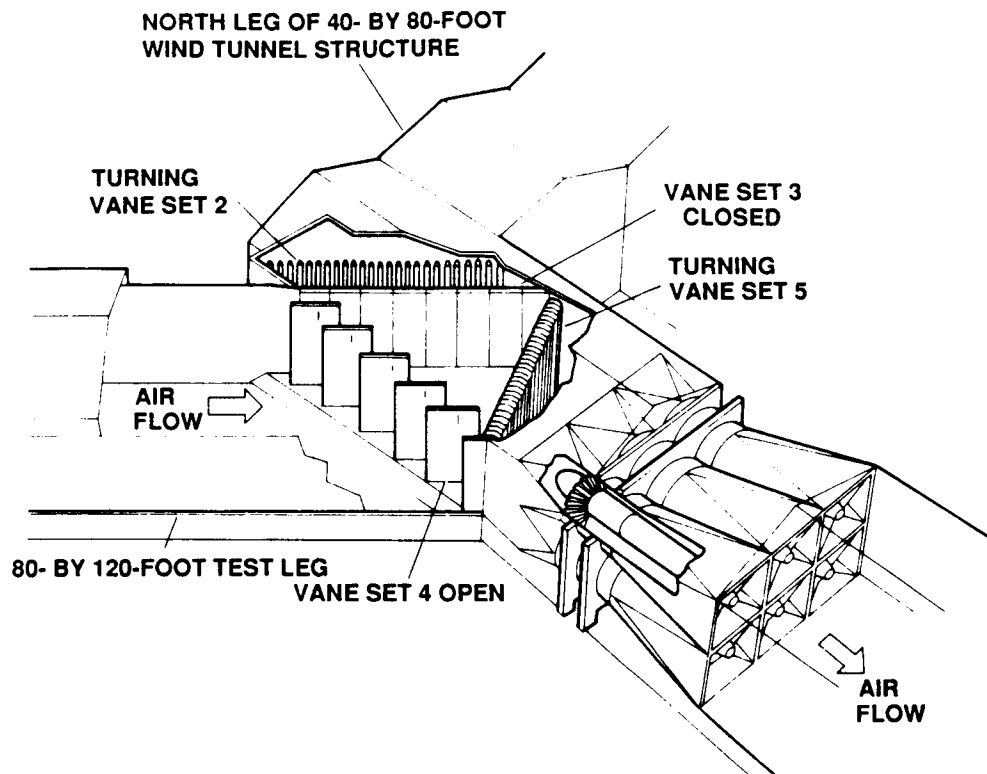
Intersection between the 40- by 80-Foot and 80- by 120-Foot Wind Tunnels (80- by 120-Foot Wind Tunnel mode).
